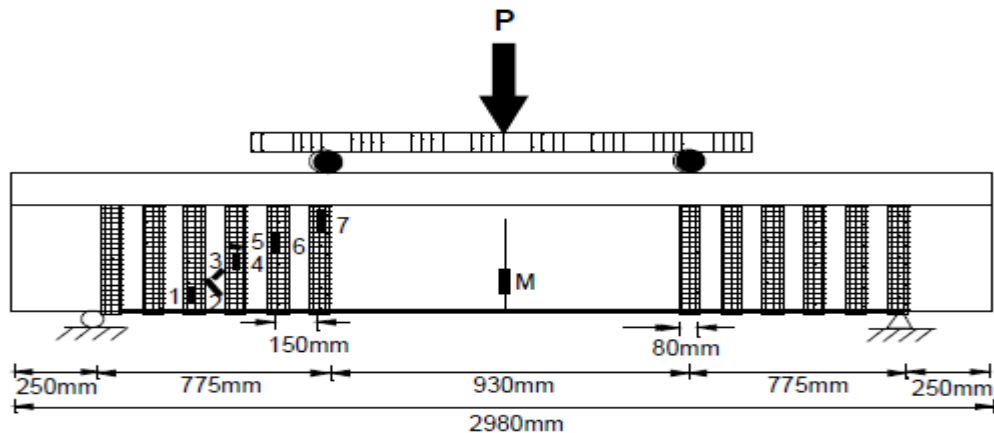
A Specimens TT1-1, TS1-1, TS1-11
